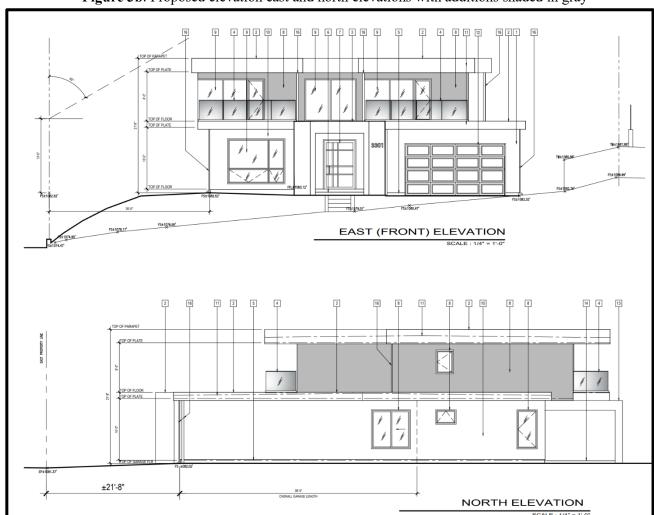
Proposed elevation east and north elevations with additions shaded in gray
